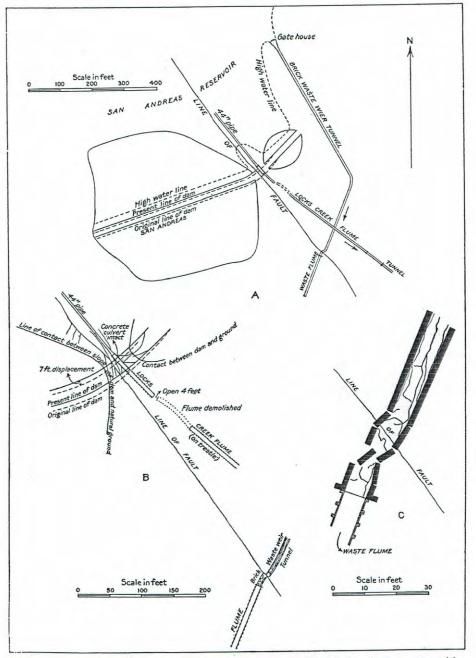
Intersection of San Andreas dam by fault. A. Plan of dam in two parts, with rock between. B. Relation of dam to waste weir tunnel. C. Detail of waste weir tunnel.
